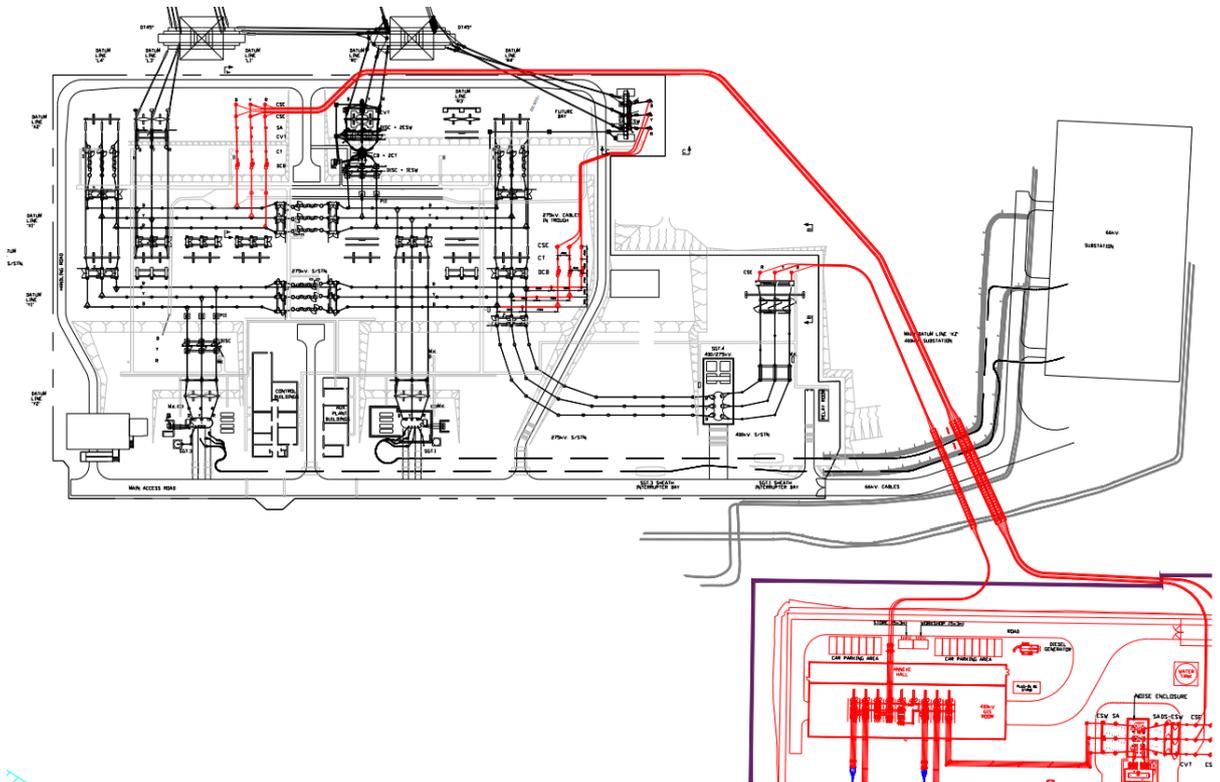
Route of HVAC cables between the Substation and existing Hawthorn Pit Substation
